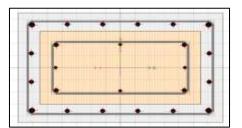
Reinforcement detailing of Column Jacketing in ETABS
